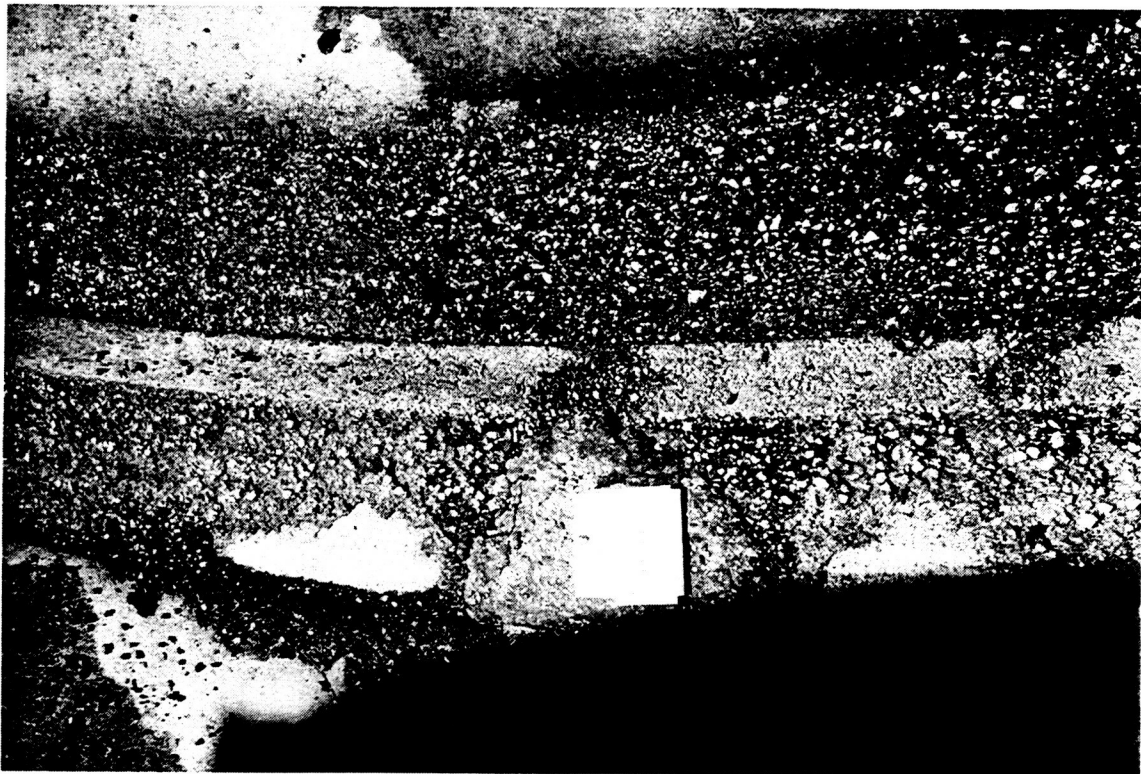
Rubberized section R1 @ 20,864 reps
